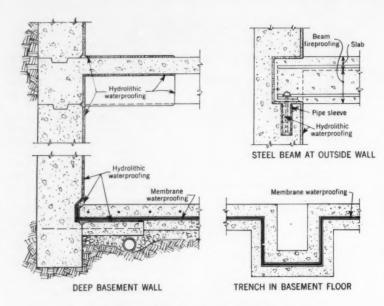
A combination of hydrolithic and membrane waterproofing is used to keep a deep basement dry.
